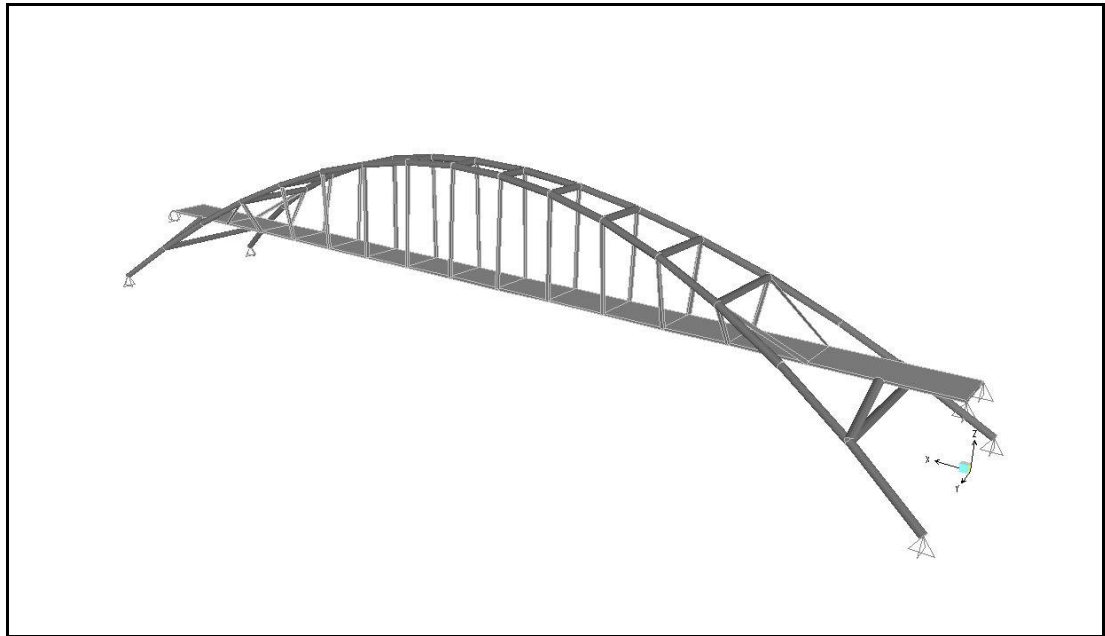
Complete Model of Pedestrian Bridge (Extruded view).
